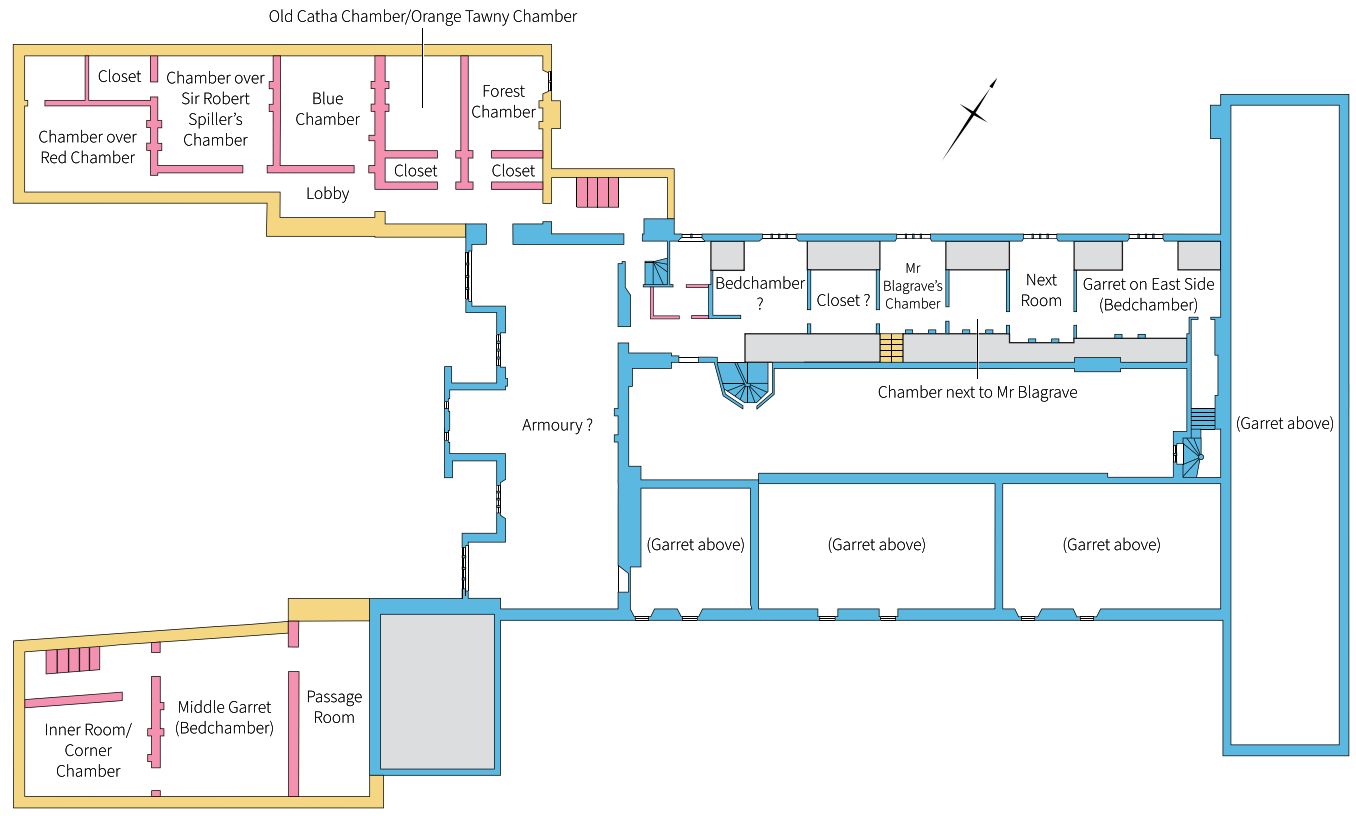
Conjectural reconstruction of the second-floor plan of Bramshill in the 1630s. Grey areas represent roofs and roof space. *Plan:* © Historic England Archive, reproduced with permission.
